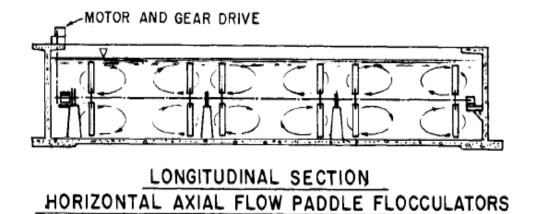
Sections through horizontal shaft paddle flocculator [3].
